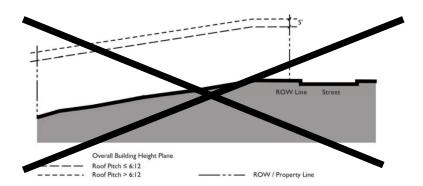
B. Pitched roof building height measurements (not drawn to scale).
